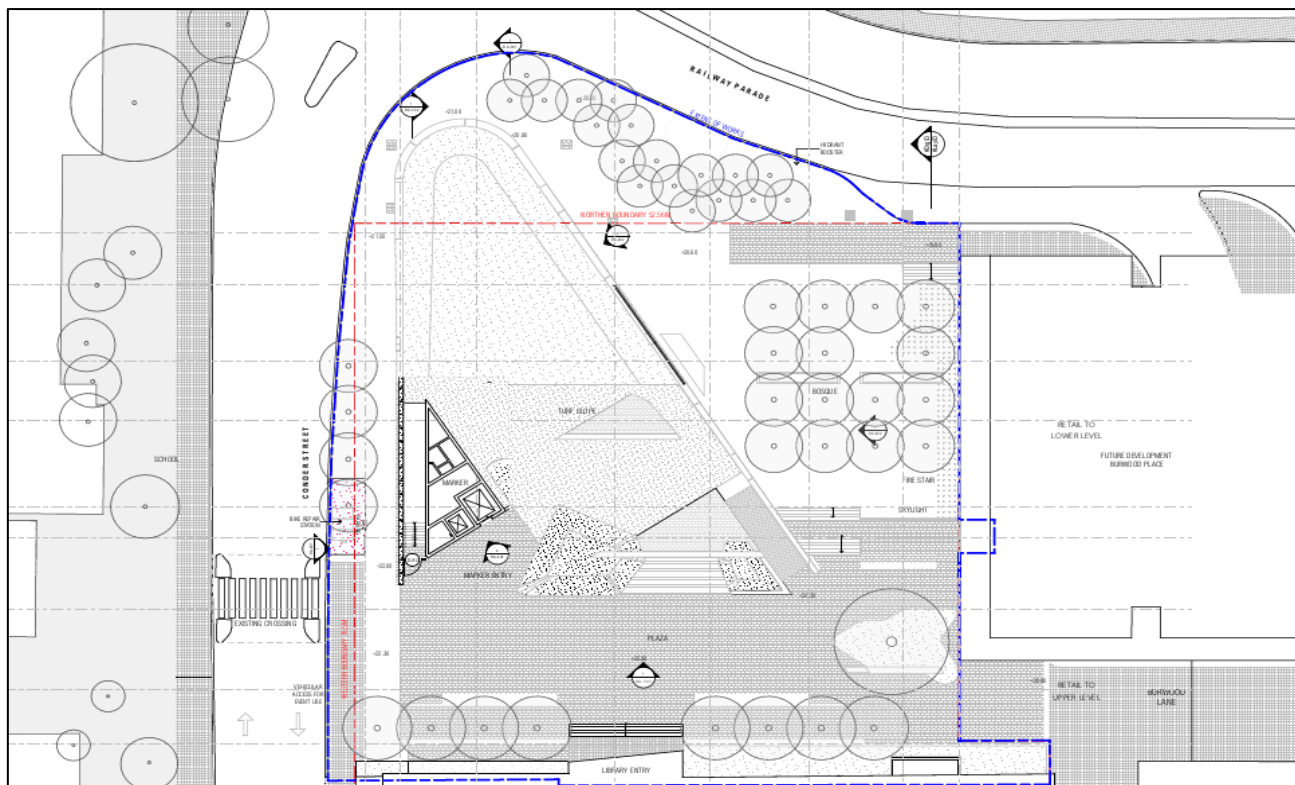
Extract of applicant's approved Site Plan, approved 10/12/2024.
